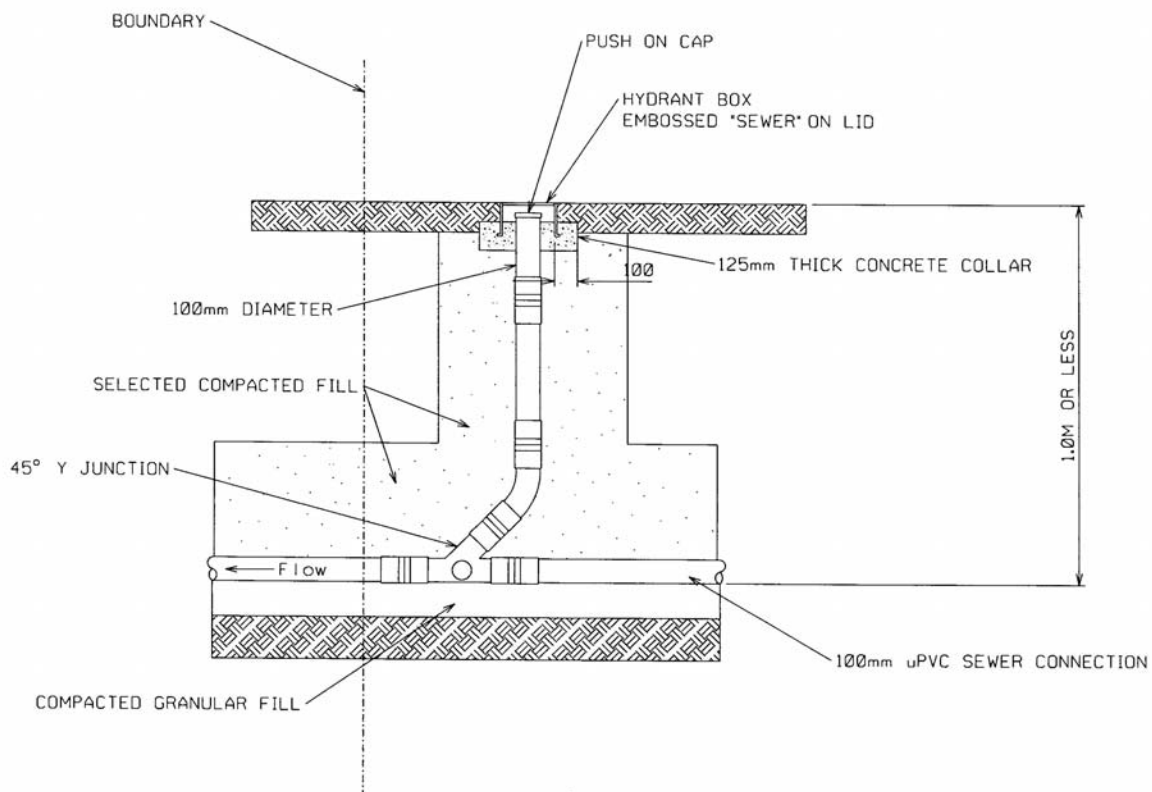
Typical layout for point of discharge for domestic discharge to public sewer within road reserve
